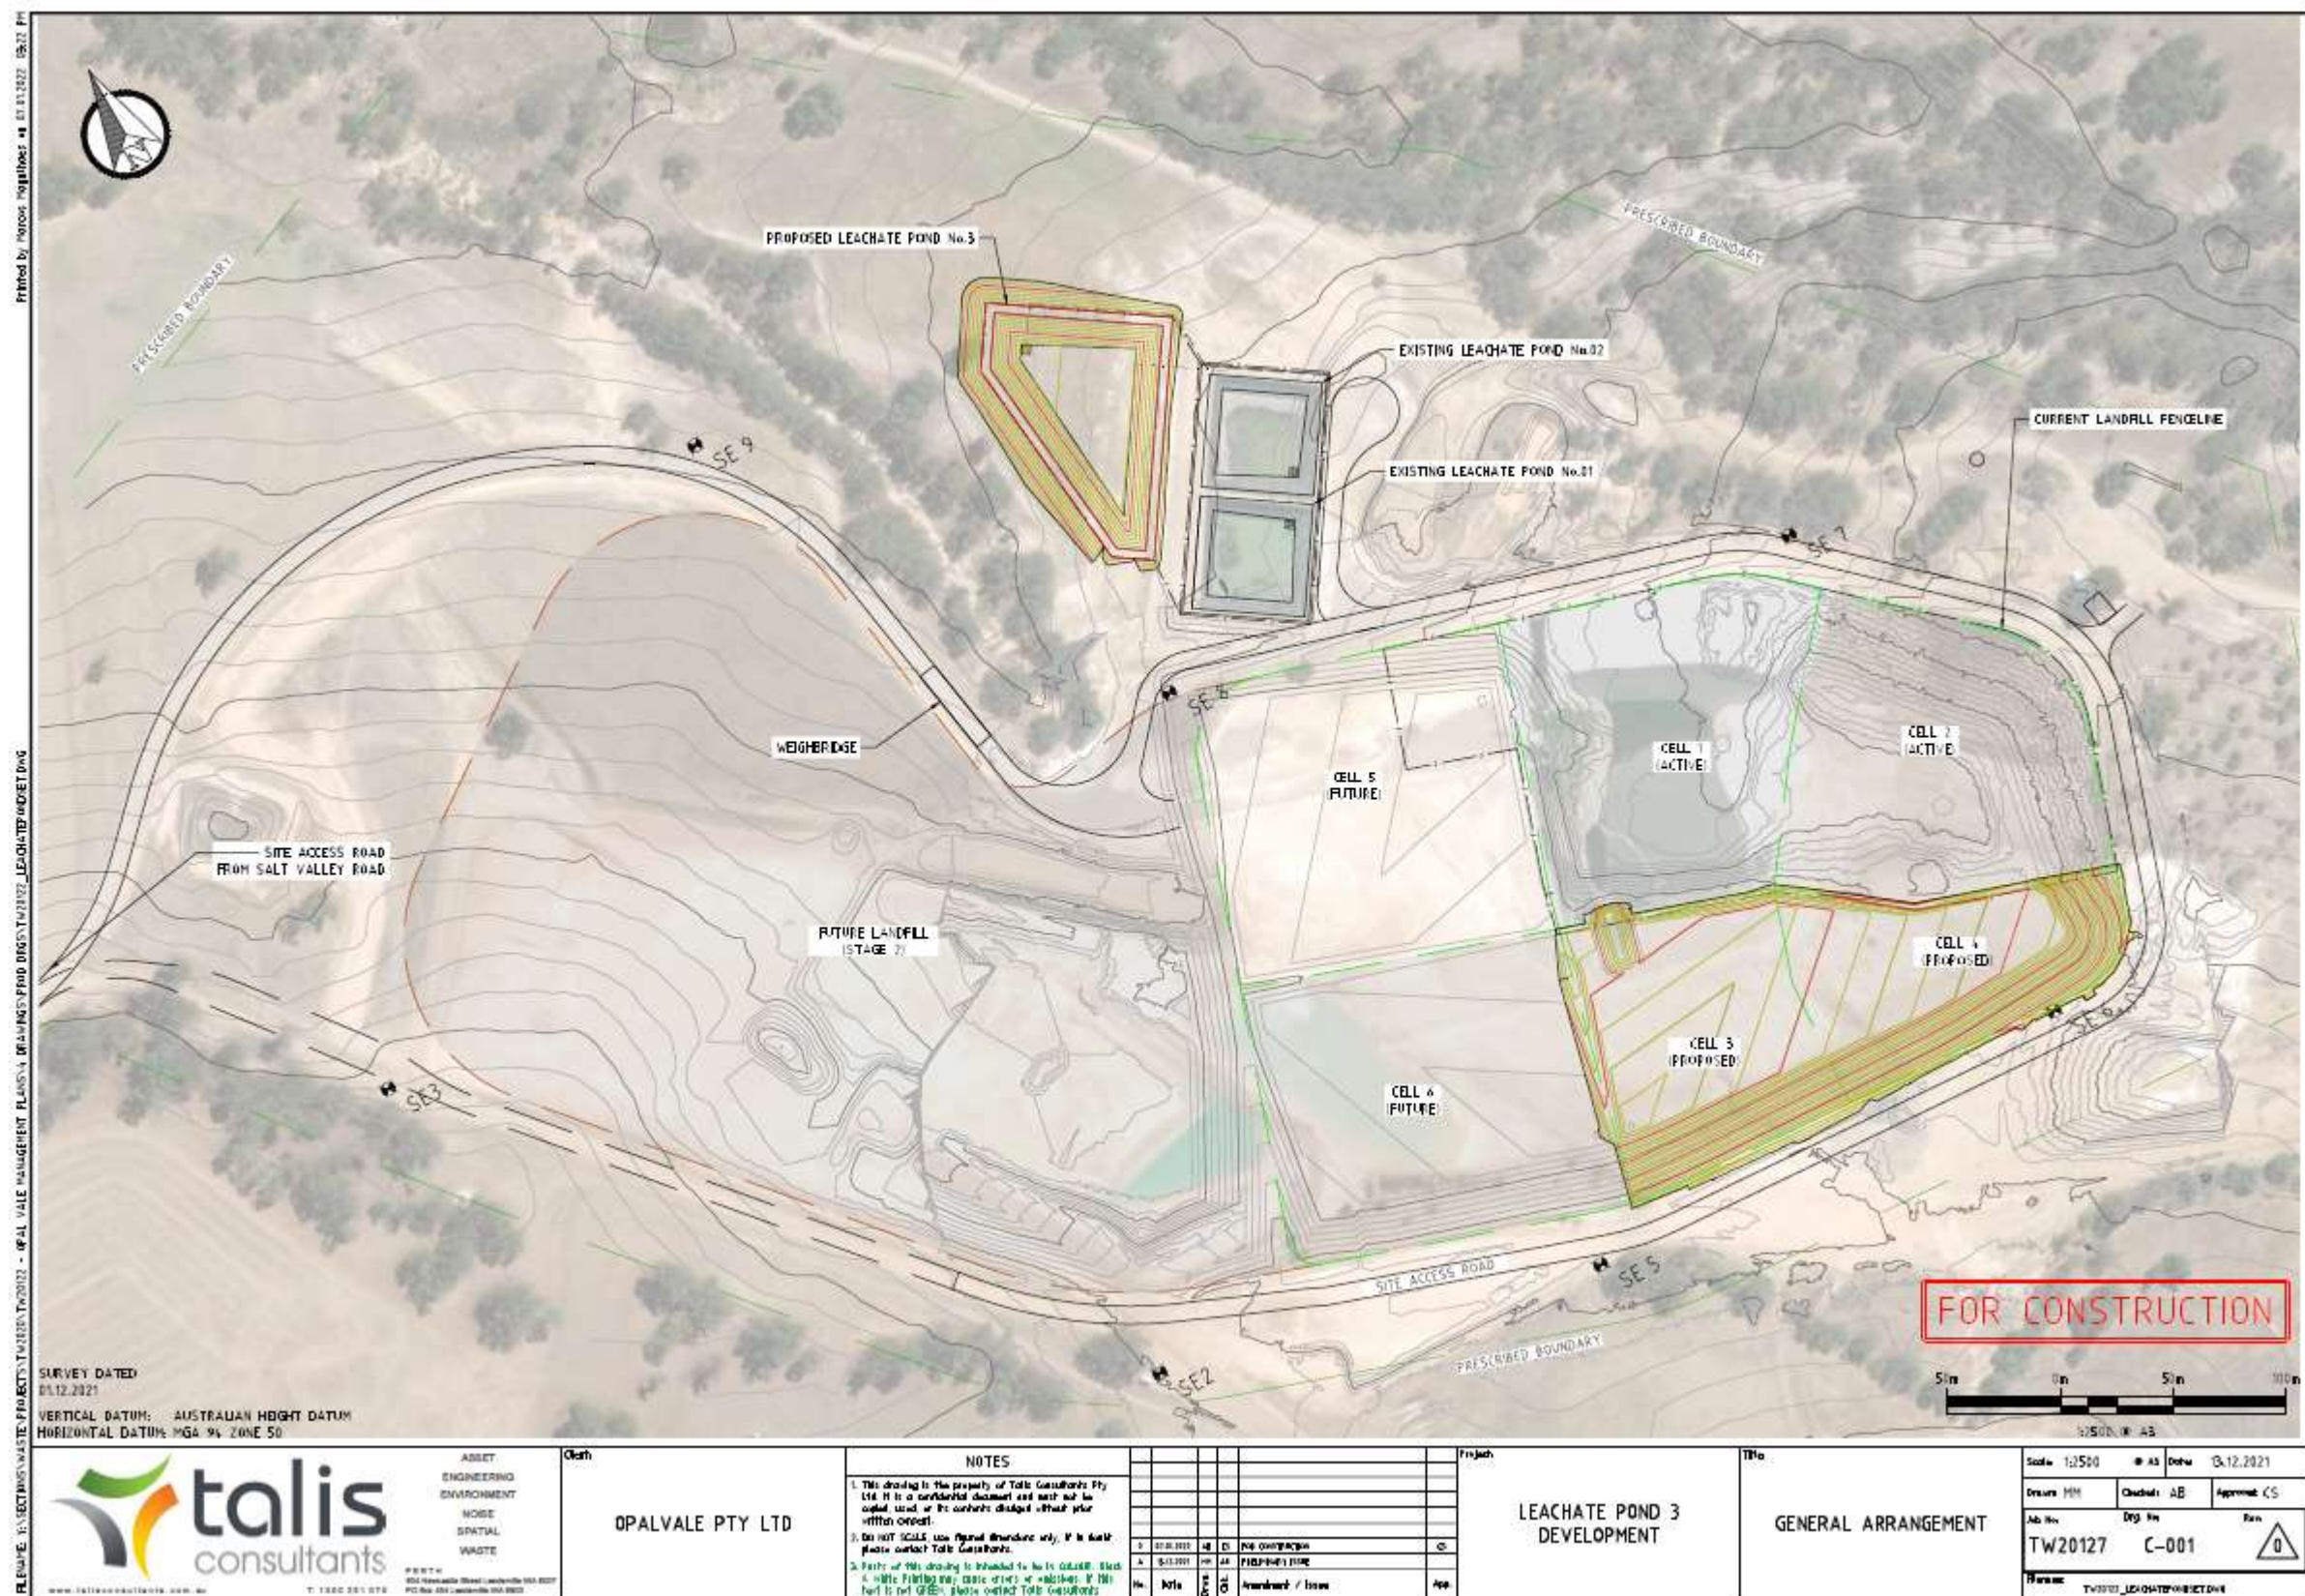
Premises layout – Cell 3/4 and Leachate pond 3 construction
